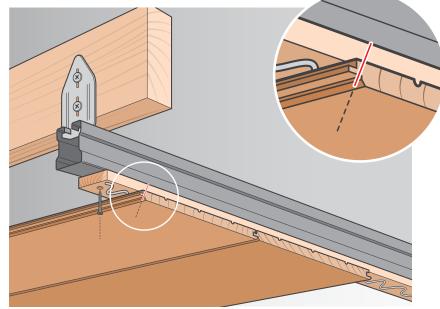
Panelling installation using metal track system / timber batten / secret nail and glue.
